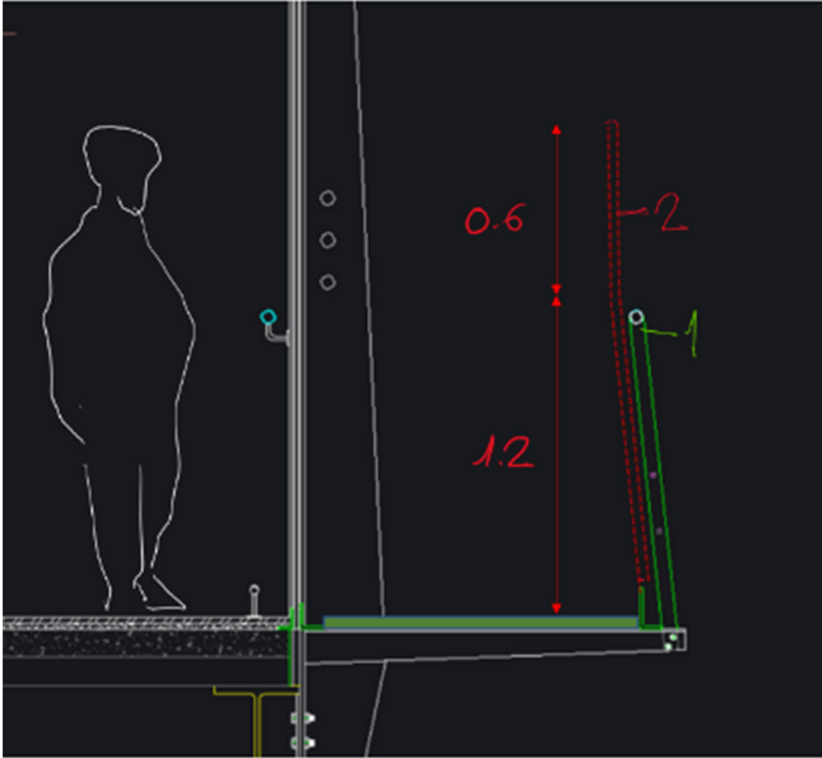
Section of the Existing Maintenance Platform - 1 (green) - existing railing; 2 (red) - potential guard extension
